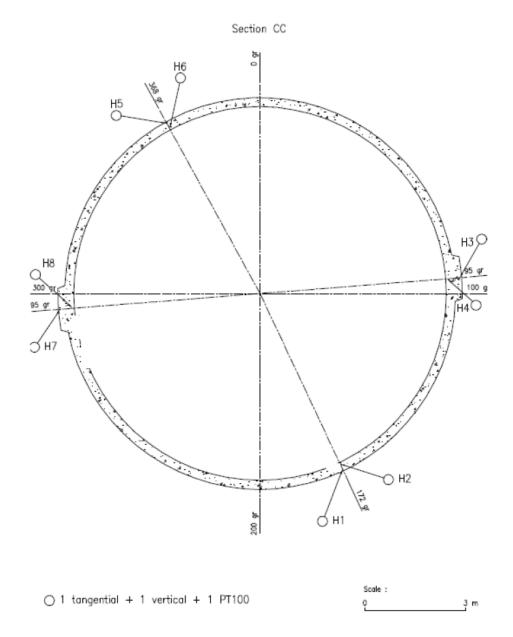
Position of the strain gauges and thermometers in the cylindrical part – section view
